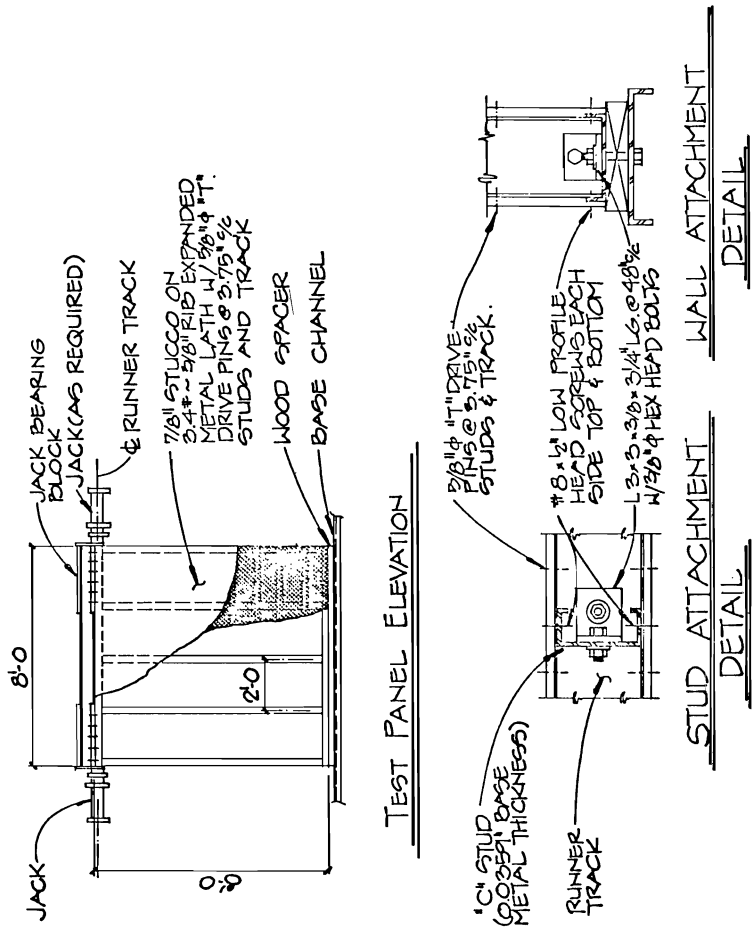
Test Assembly Plan & Details - Wall Type "G"
